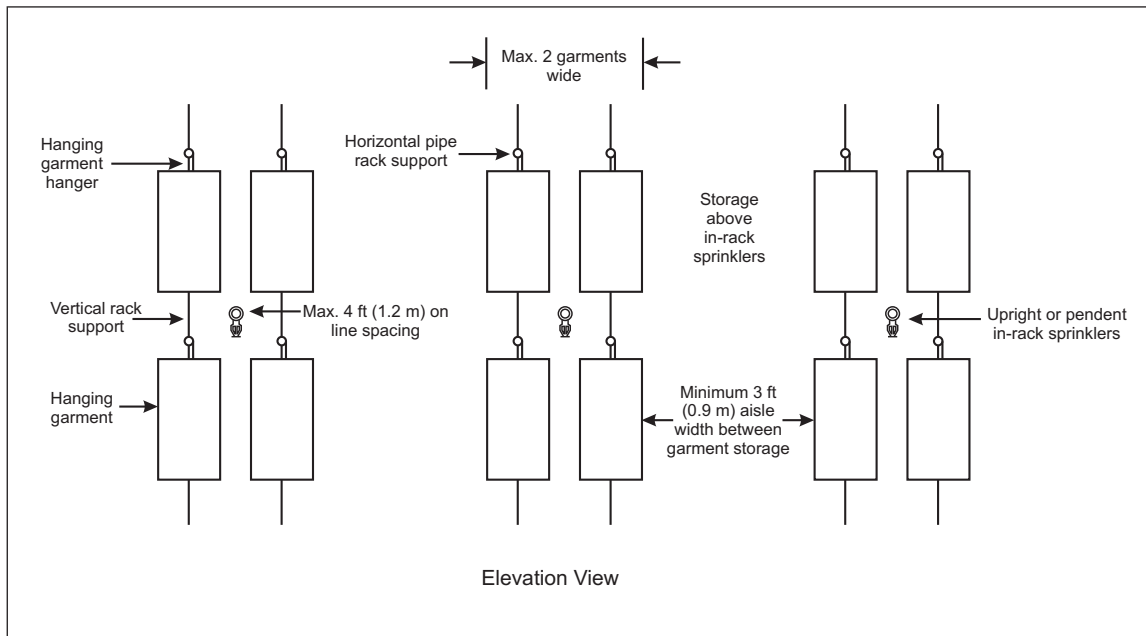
Horizontal location of in-rack sprinklers for storage up to hanging garment rows wide
